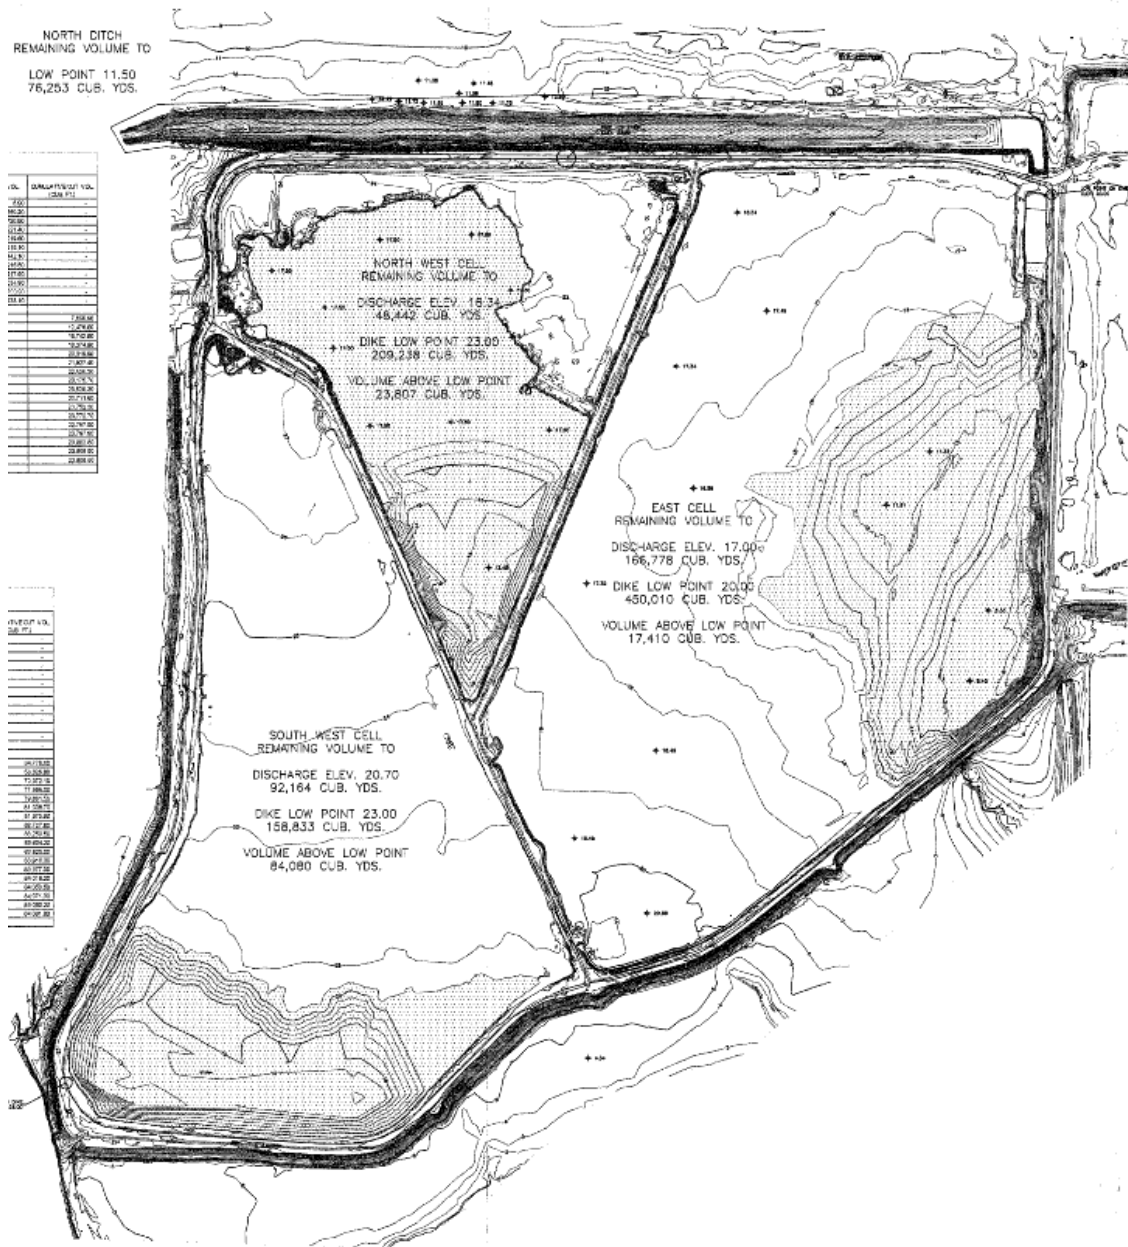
Fly Ash Pond Plan View (GPC Drawing No. 3727LAN)
